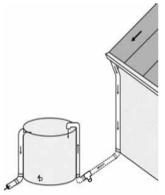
A typical rainwater harvesting system uses a roof, gutters, downspout and pipes underground, and backup into the top of the collection tank. This prevents livestock from damaging the pipes and allows the tank to be much further away from the shed. Unless there is a drain along the lower pipe, the standing pipes will contain water that is susceptible to freezing.
